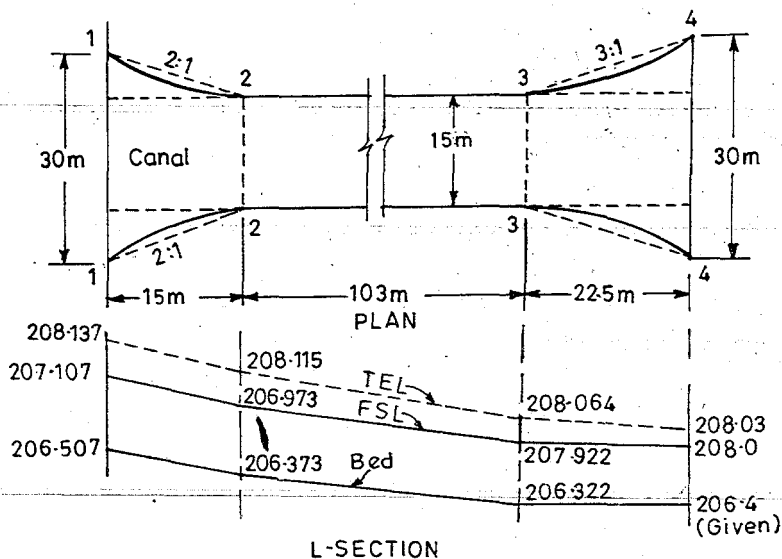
Plan and Section of Canal Trough in Example 14.25.
